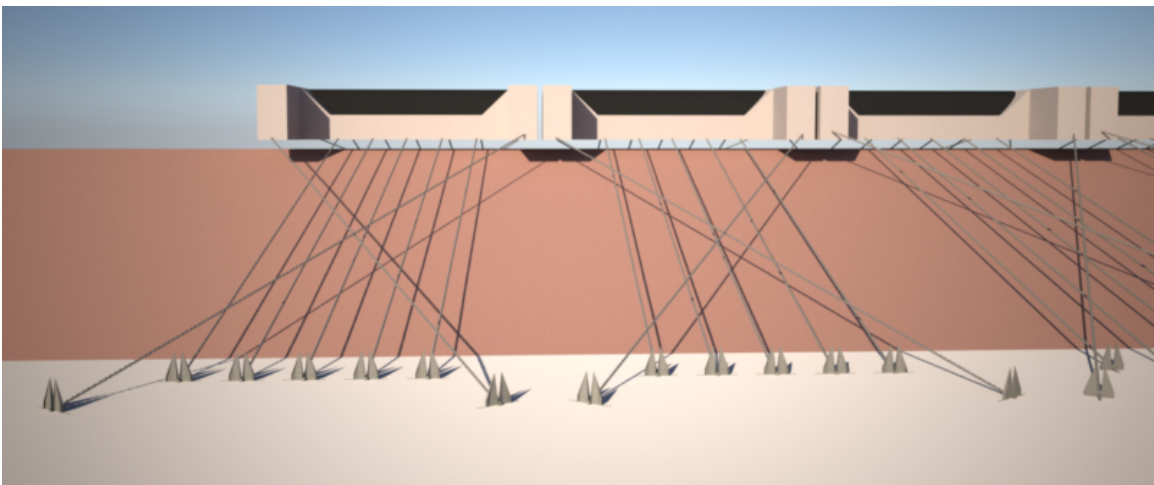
IMPRESSION DRAWING, FRONT VIEW
